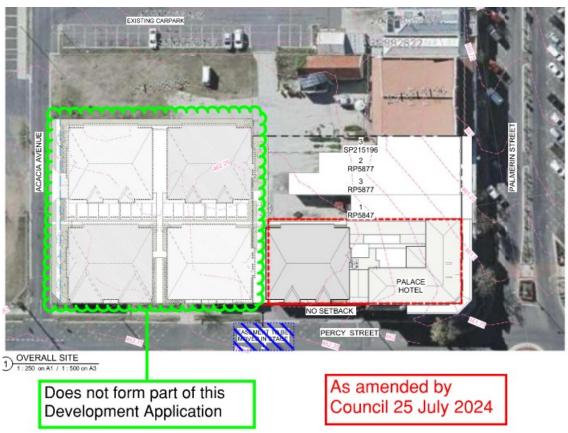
Proposed Overall Site Plan (Amended by Council 25 July 2024)
